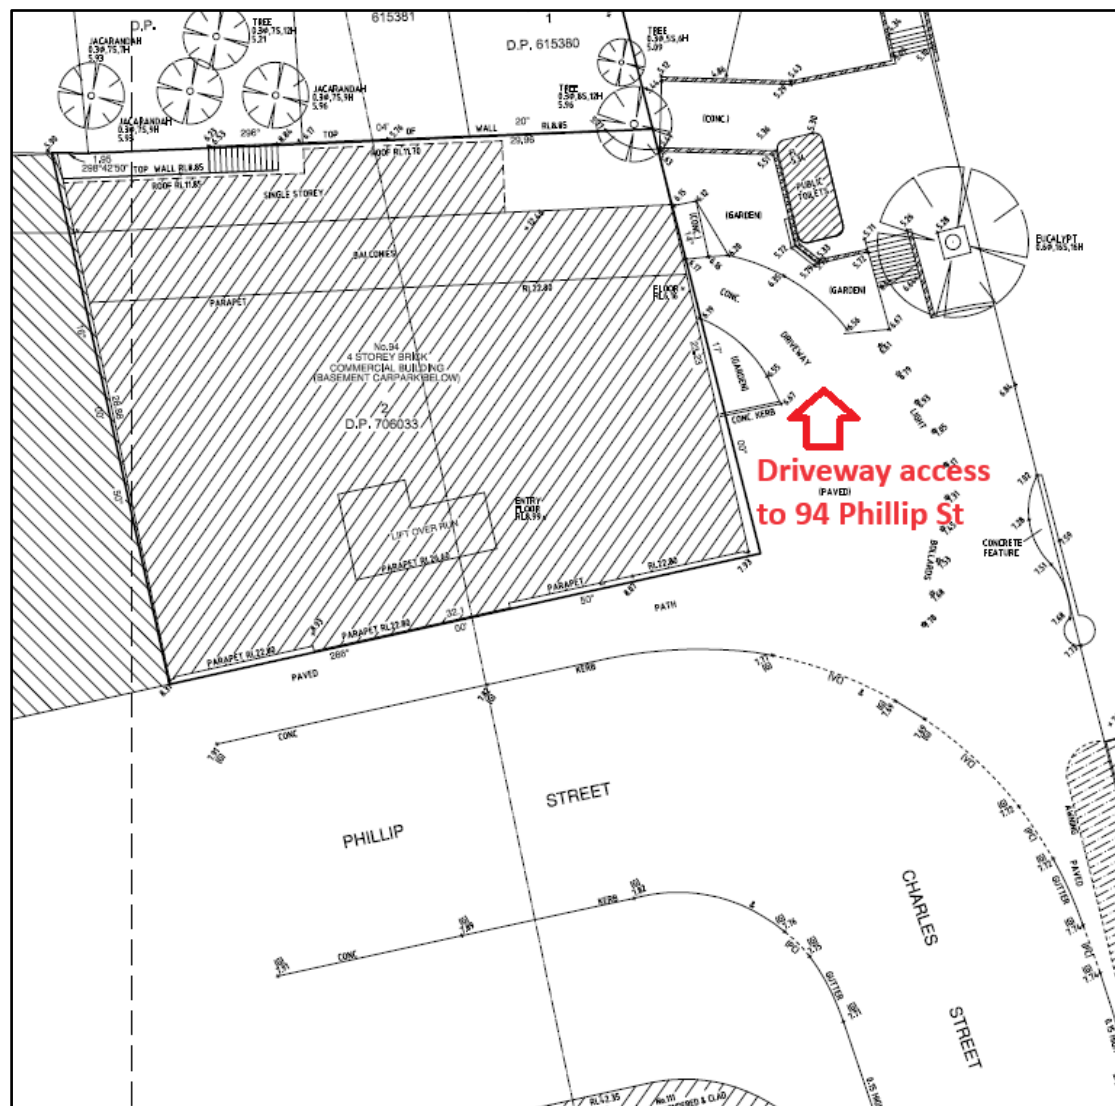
Extract from site survey indicating location of current driveway access to 94 Phillip St over unmade portion of Charles Street (Source Applicant's site survey – Norton Survey Partners)
